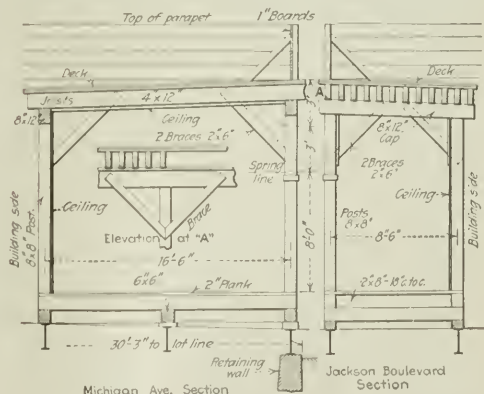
STRUCTURAL DESIGN OF SIDEWALK GALLERY
